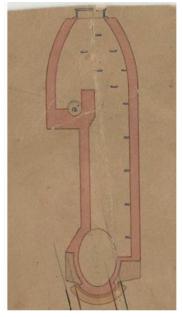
Irregular brick manhole with parallel 12" collector at a higher elevation
